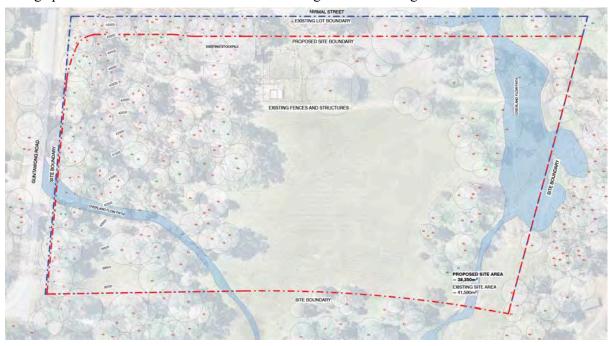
The existing layout. (Source: Architectural Plan Set by Djrd Architects Issue 6 dated 20/01/2025).
